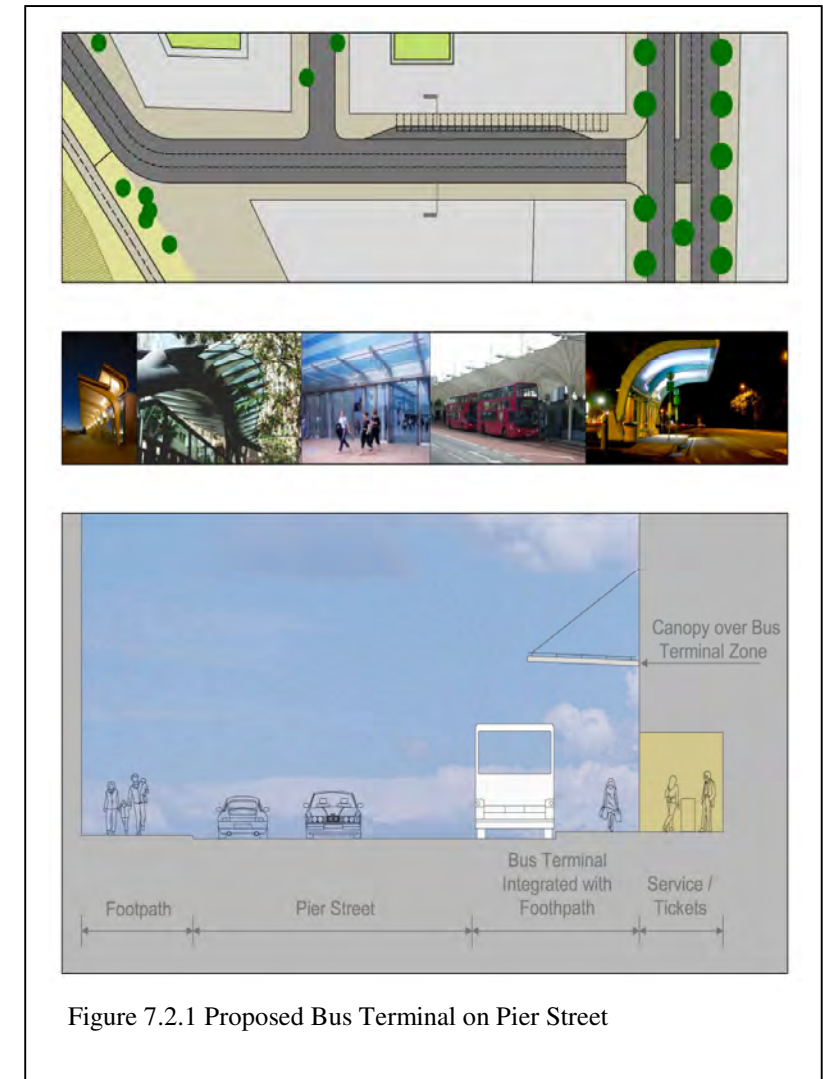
Proposed Bus Terminal on Pier Street
